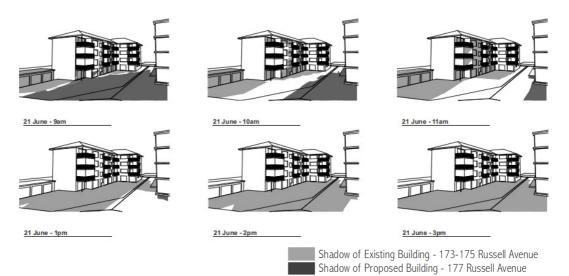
Potential shadowing – existing buildings vs proposed height (Winter) – shadow cast by existing trees not shown
